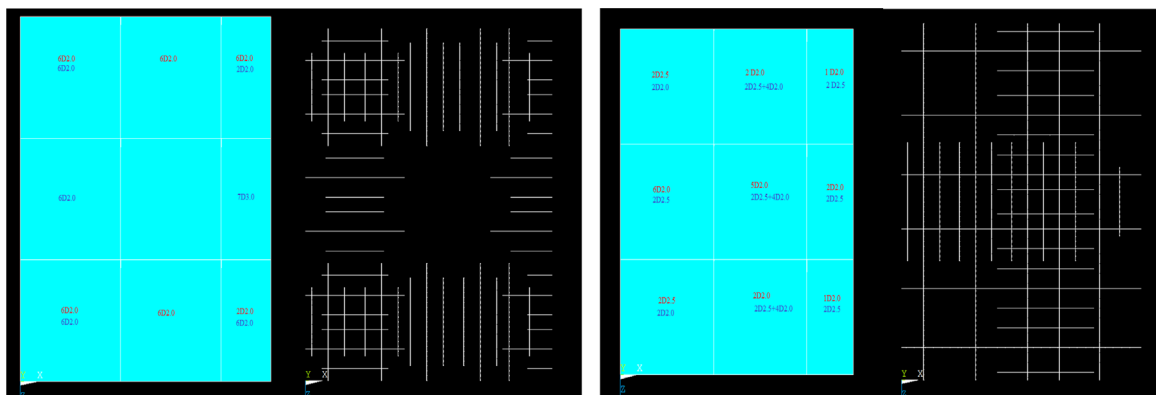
The reinforcing bar arrangement; top slab (left), bottom slab (right).
